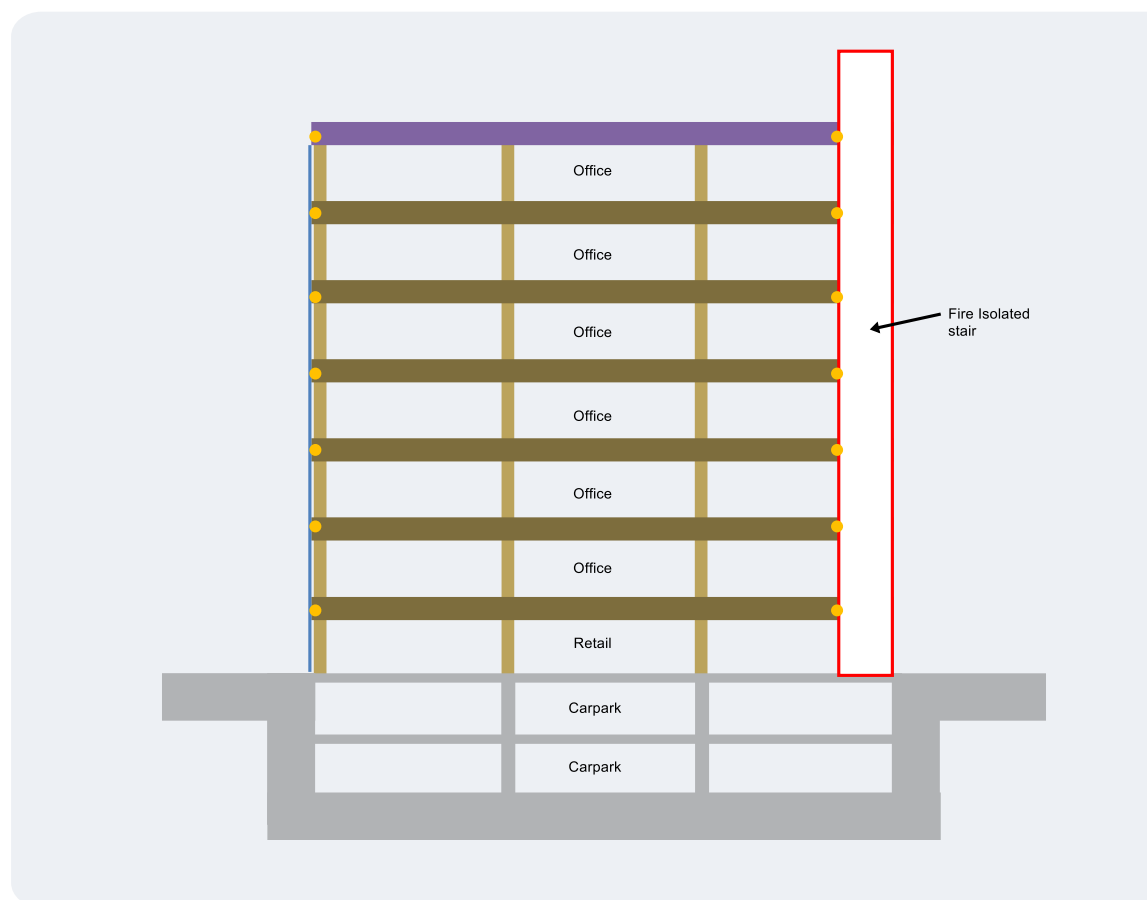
Vertical section of a commercial building showing typical cavity barrier positions.
